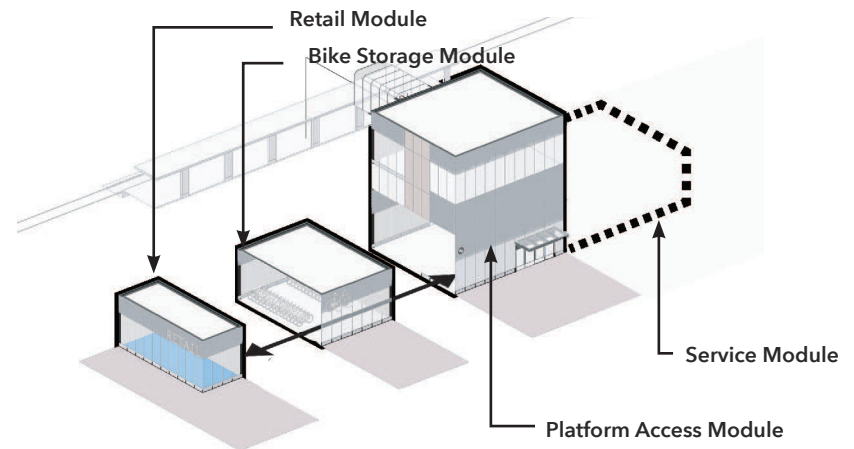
Planning Diagram of un-staffed Station Building (type B), illustrating Bridge Platform Access.
